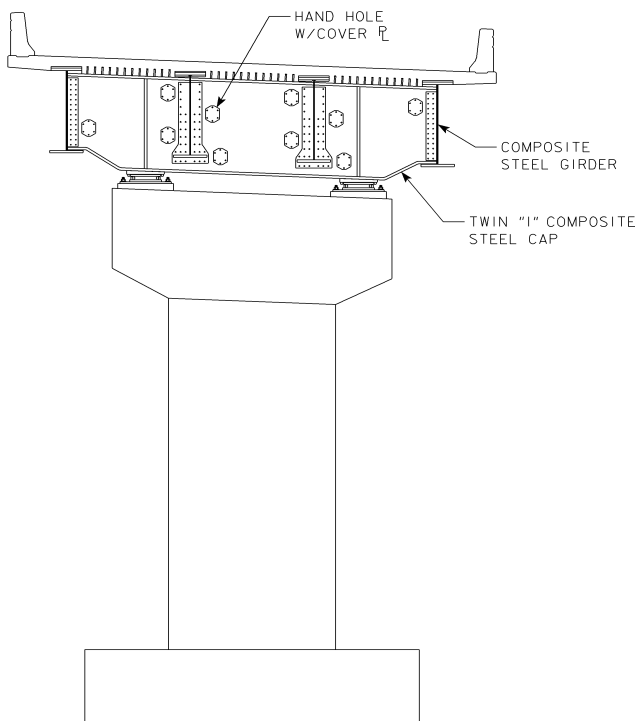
Hammer Head Pier With Integral Steel Pier Cap
